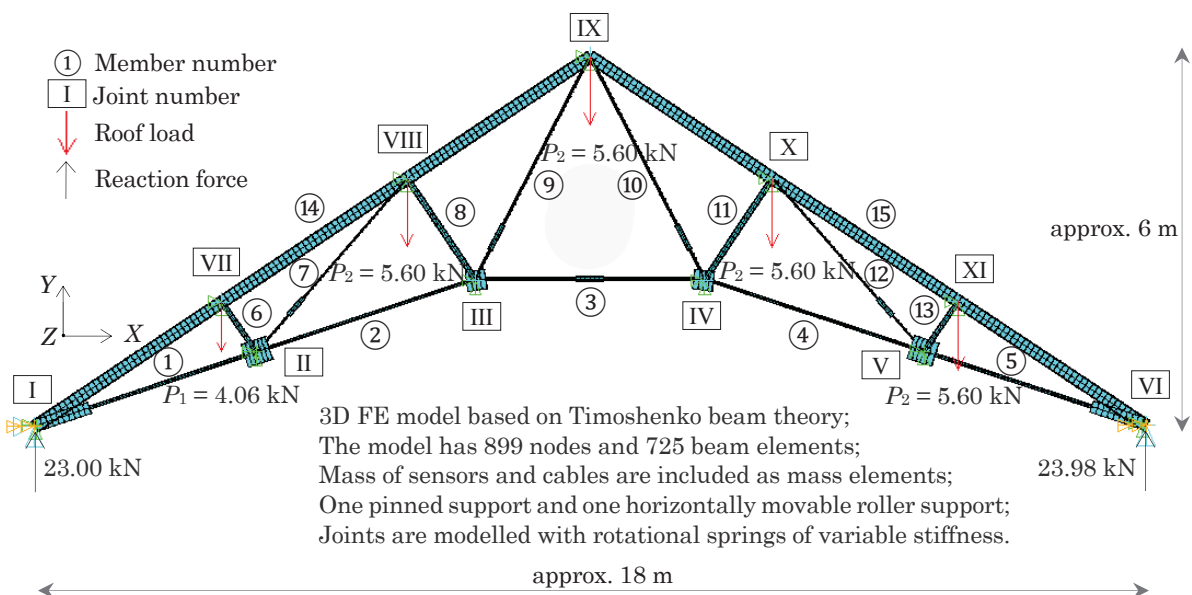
Global finite element model of the truss with assumed applied roof loads.
